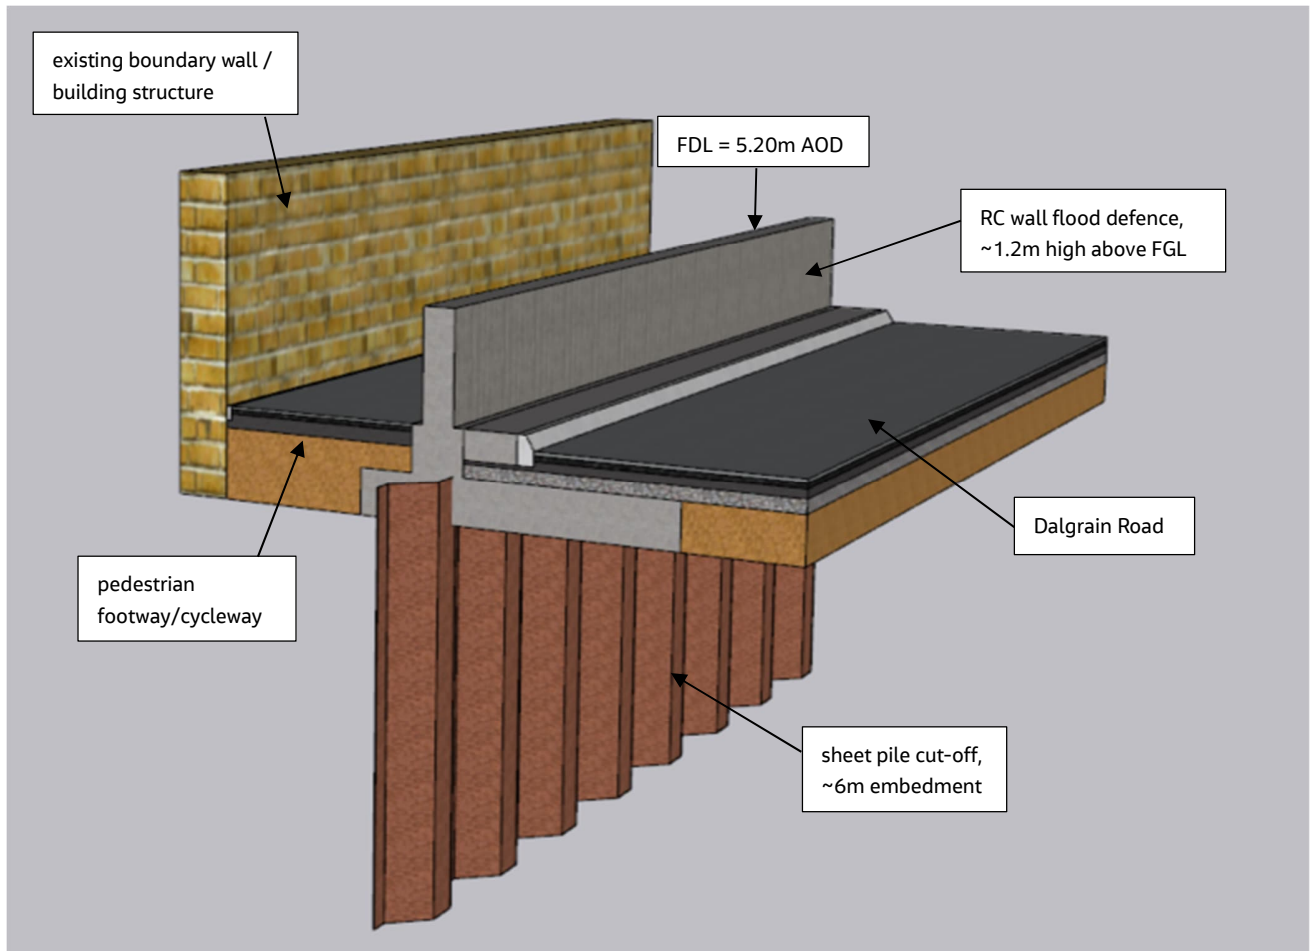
Option D2, RC cantilever flood wall with seepage cut-off
